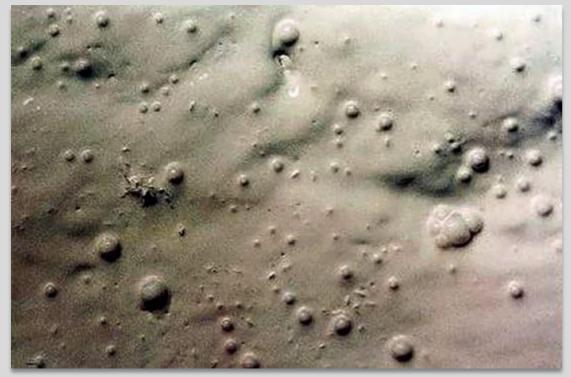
Bubbles within a paint film appear as small blisters. These may be intact or broken (leaving a crater). Can be found in excessively thick paint films, especially if spray applied, and also with roller application. This should not be confused with blistering.
